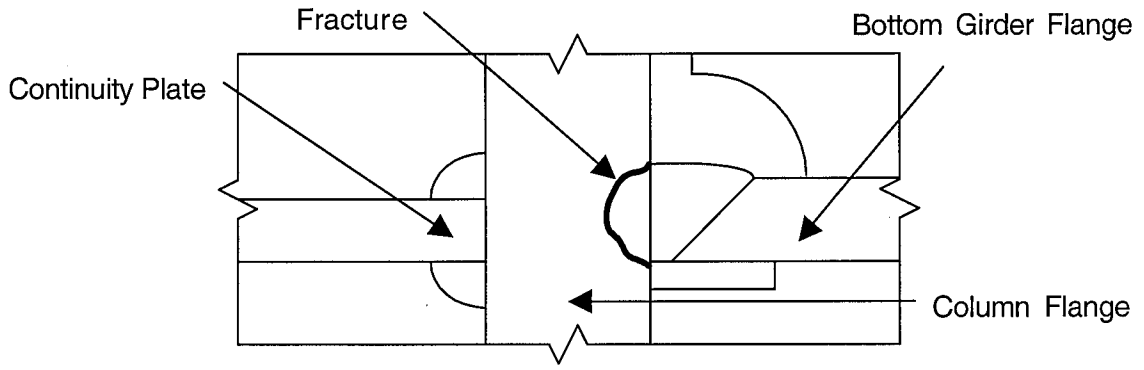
Damage Type C2* (Girder Flange Pull-Out From Column Flange)
